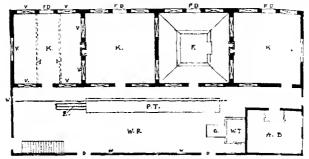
Fig. VI.-Four-kiln Evaporator, Ground Floor Plan.
